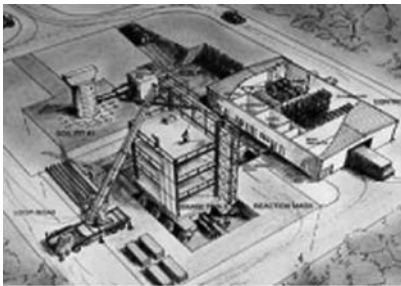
Facility layout including shake-table and adjacent large soil pits (<http://nees.ucsd.edu>).
